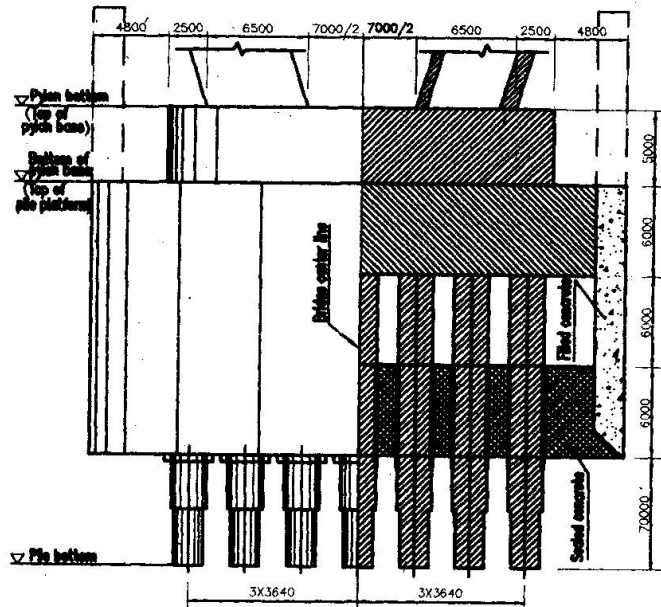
Cast-in-situ bored pile foundation with double-walled cofferdam
